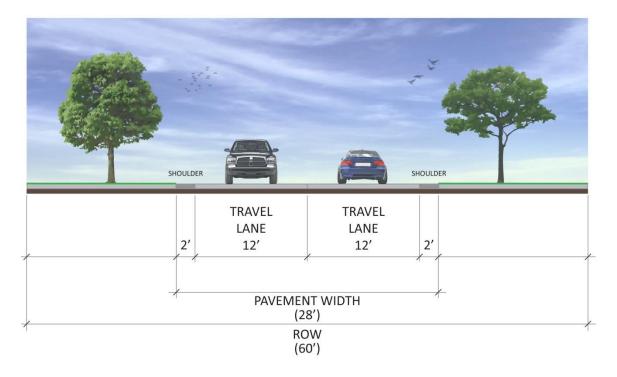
Recommended Rural Local Street Cross-Section
